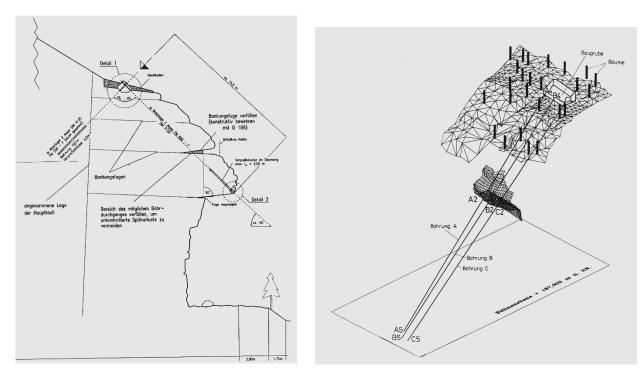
Anchor design (3 anchors) to stabilize the overhanging rock block (Konietzky, 2000)
